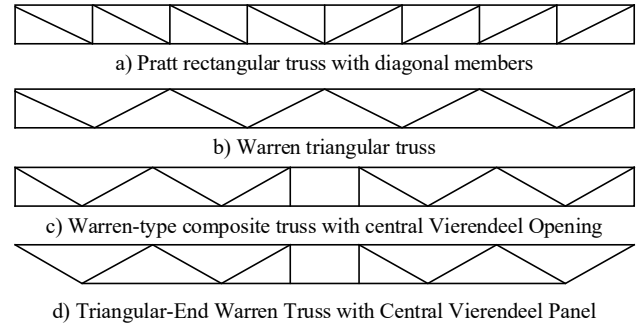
Common types of steel truss systems used in steel-concrete composite structures
